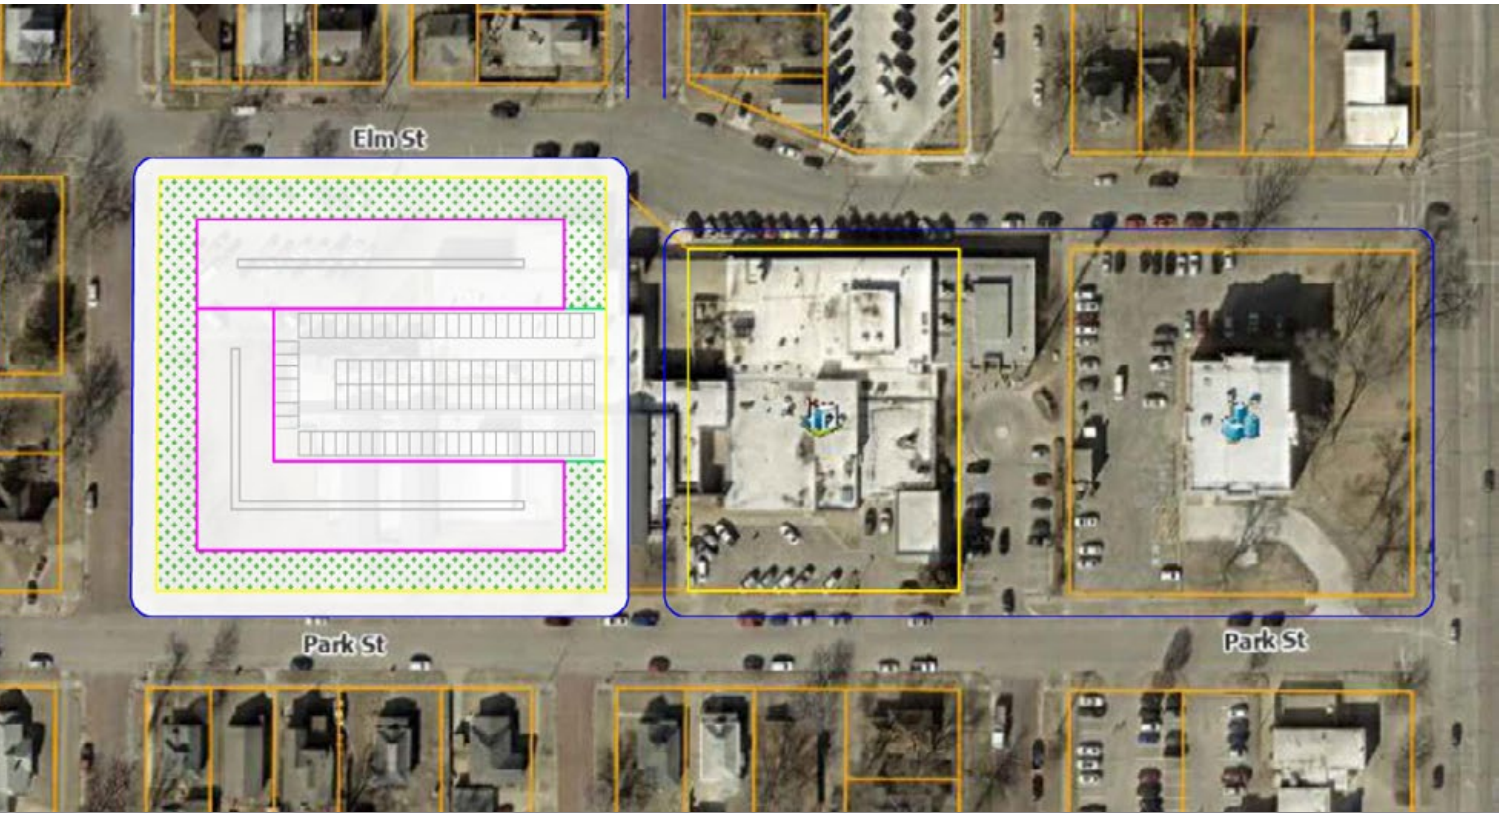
Senior Housing Massing Site Plan, Old Jail Site
